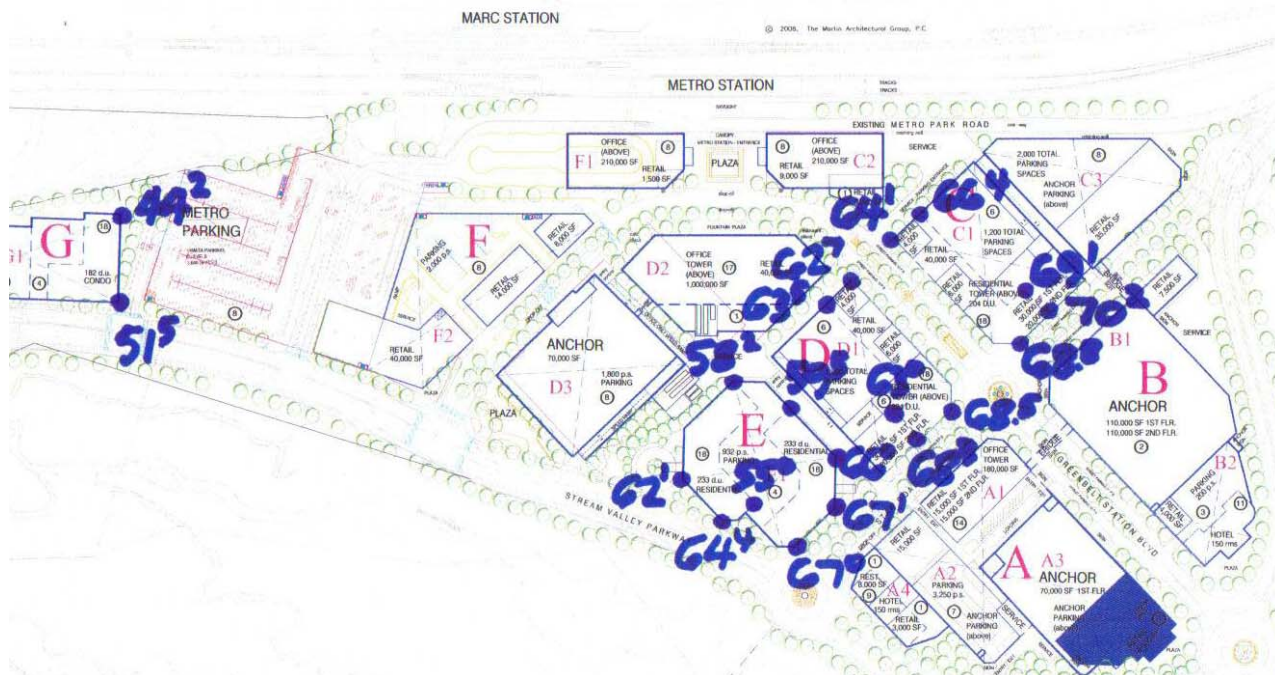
Year 2030 Highway DNL at Facades of Residences on 18<sup>th</sup> Floor
